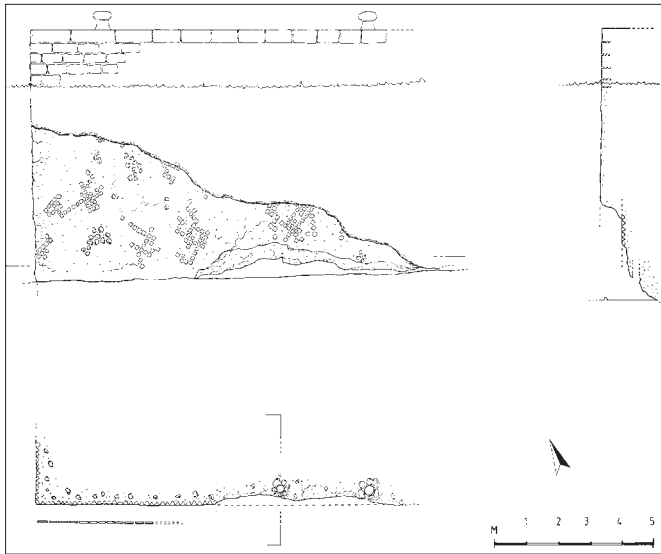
Offset shuttering used to form the quasi-*opus reticulatum* faced concrete pier in the harbour at Ponza (Gianfrotta 1996: 71; used with permission).
